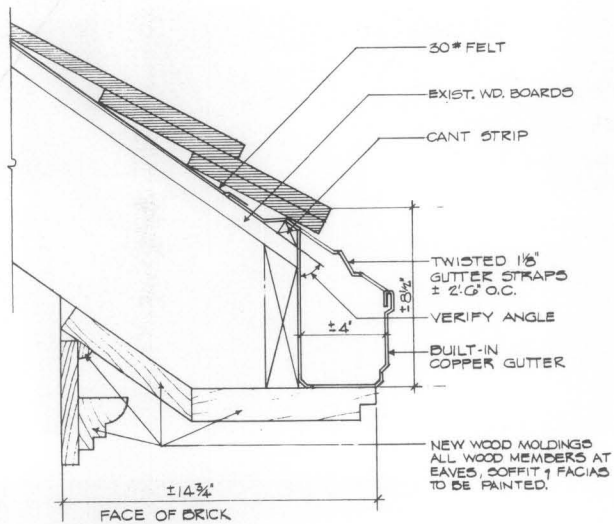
Both a cant strip and a double layer of tiles are used here to raise the first row of tiles to ensure proper roof drainage. This drawing was prepared for the restoration of the 1911-1912 Jamaica Pond Boathouse, Jamaica Plain, Massachusetts, which is part of the original Boston Park system designed by Frederick Law Olmsted in the late-19th century. Drawing: Richard White, Architect/Planner.
